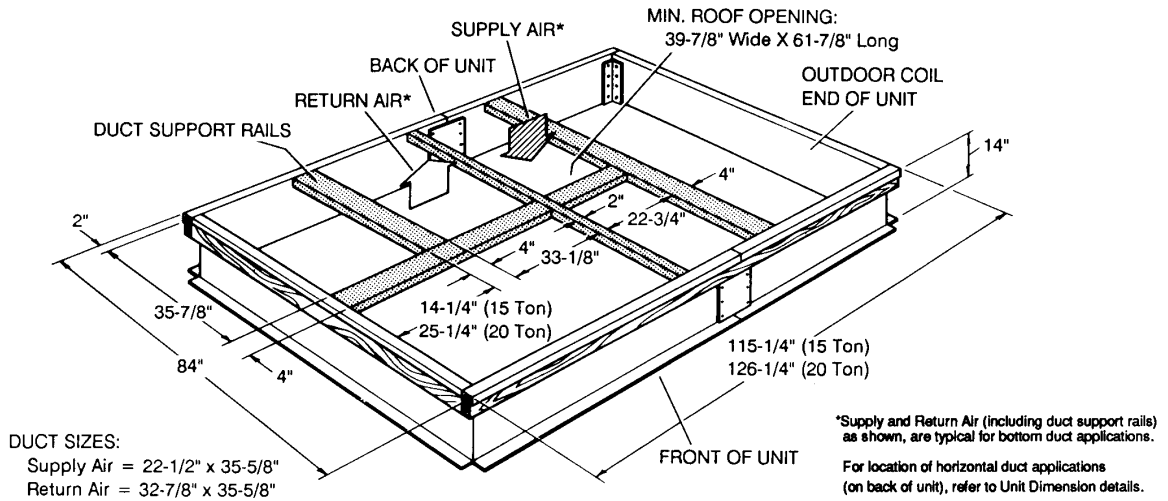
UNIT DIMENSIONS - (BCB - 15 & 20 TON) DETAIL "X" ACCY. SIDE SUPPLY & RETURN AIR OPENINGS
